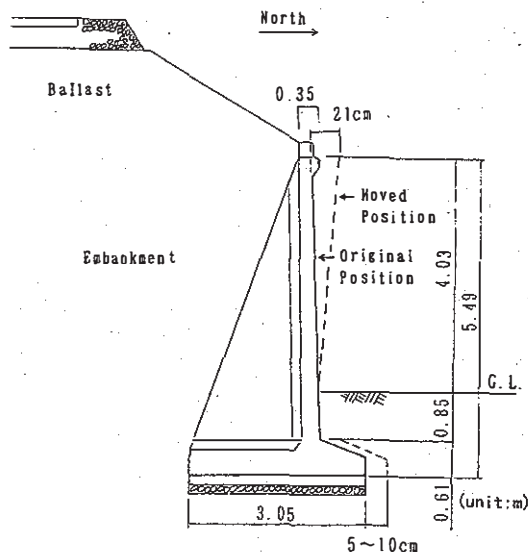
Typical cross-section of damaged buttressed RC RW without a pile foundation (CL11 in Fig. 4), Shioya Station, Sanyo Dentetsu Line.
